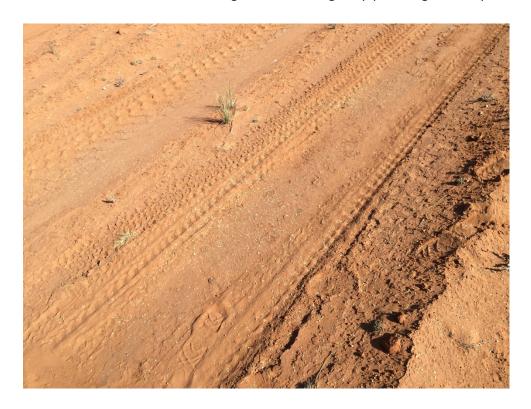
December 16, 2014: Hand-broadcasting of BLM-approved Lesser Prairie Chicken (LPC) seed mix.
